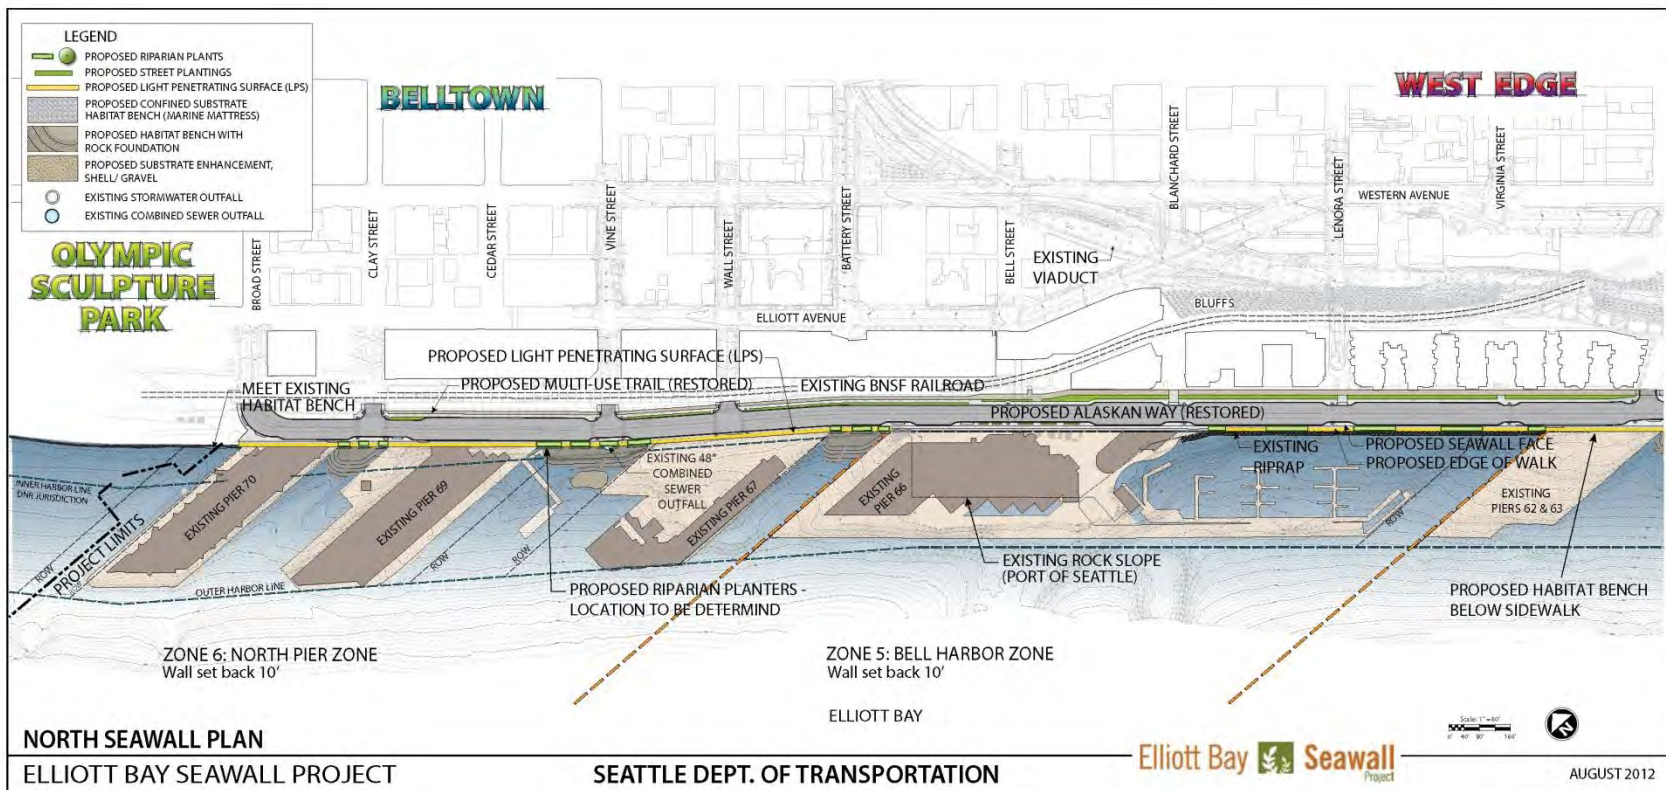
Proposed Elliott Bay Seawall Project Plan View, North Seawall
